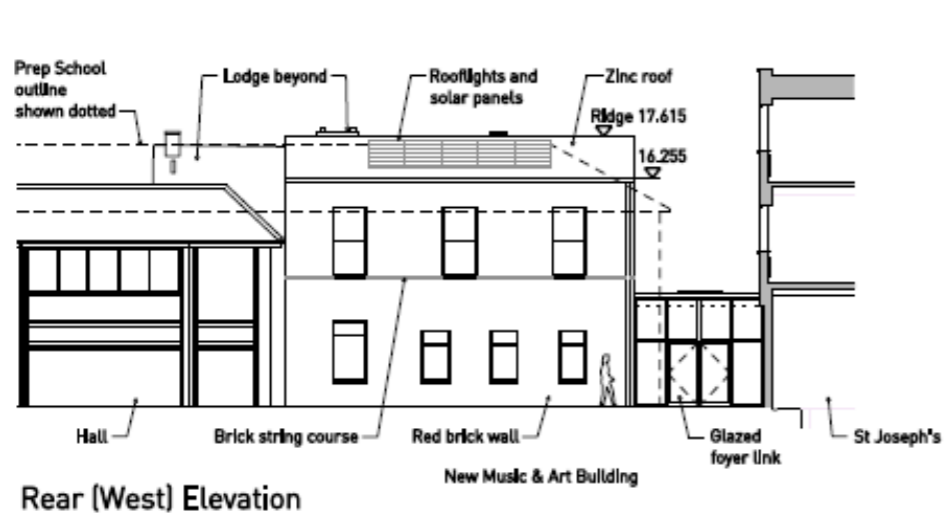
New Proposed West Elevation and Section CC (Source: Tim Ronalds Architects)
